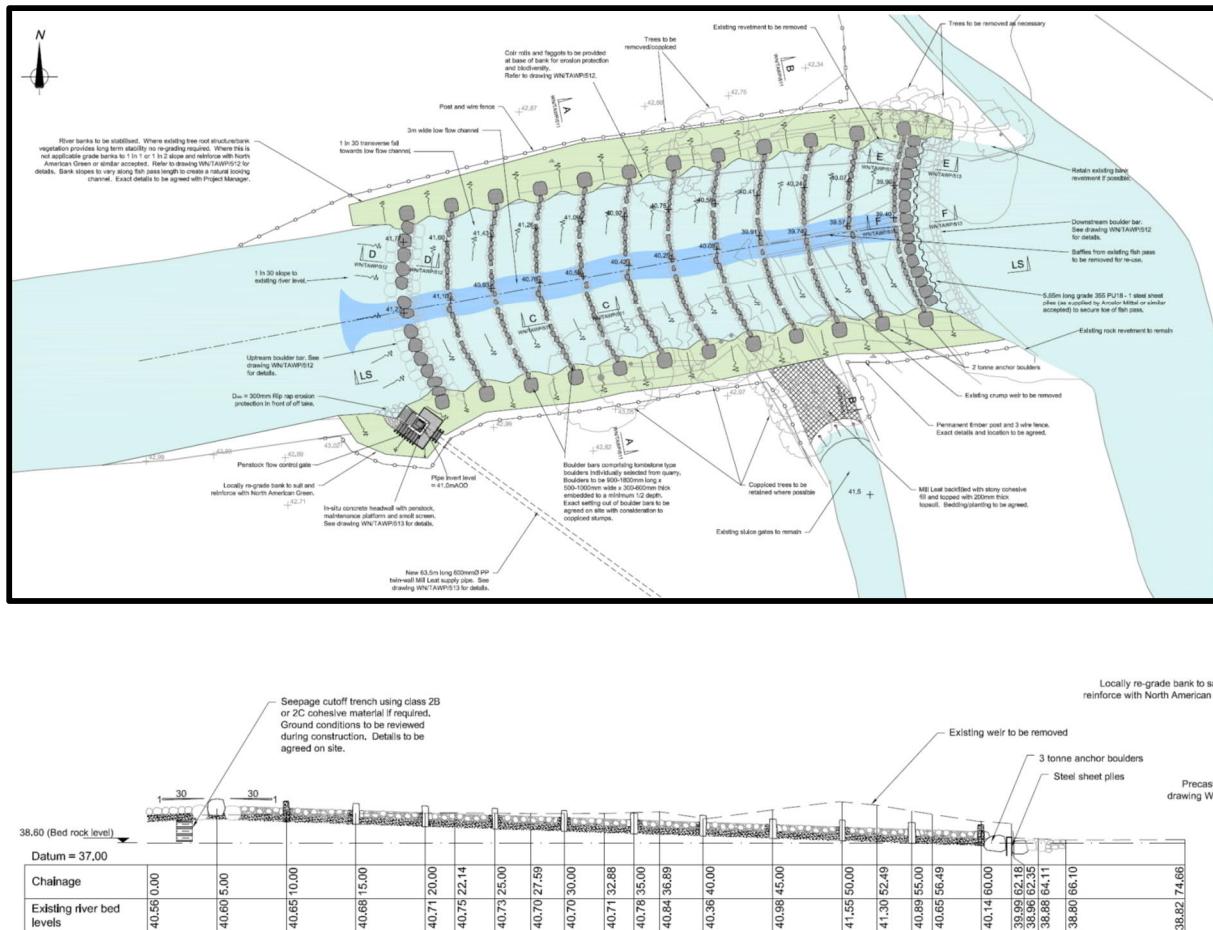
Top image shows the Detailed Plan and bottom image the Long Section.
